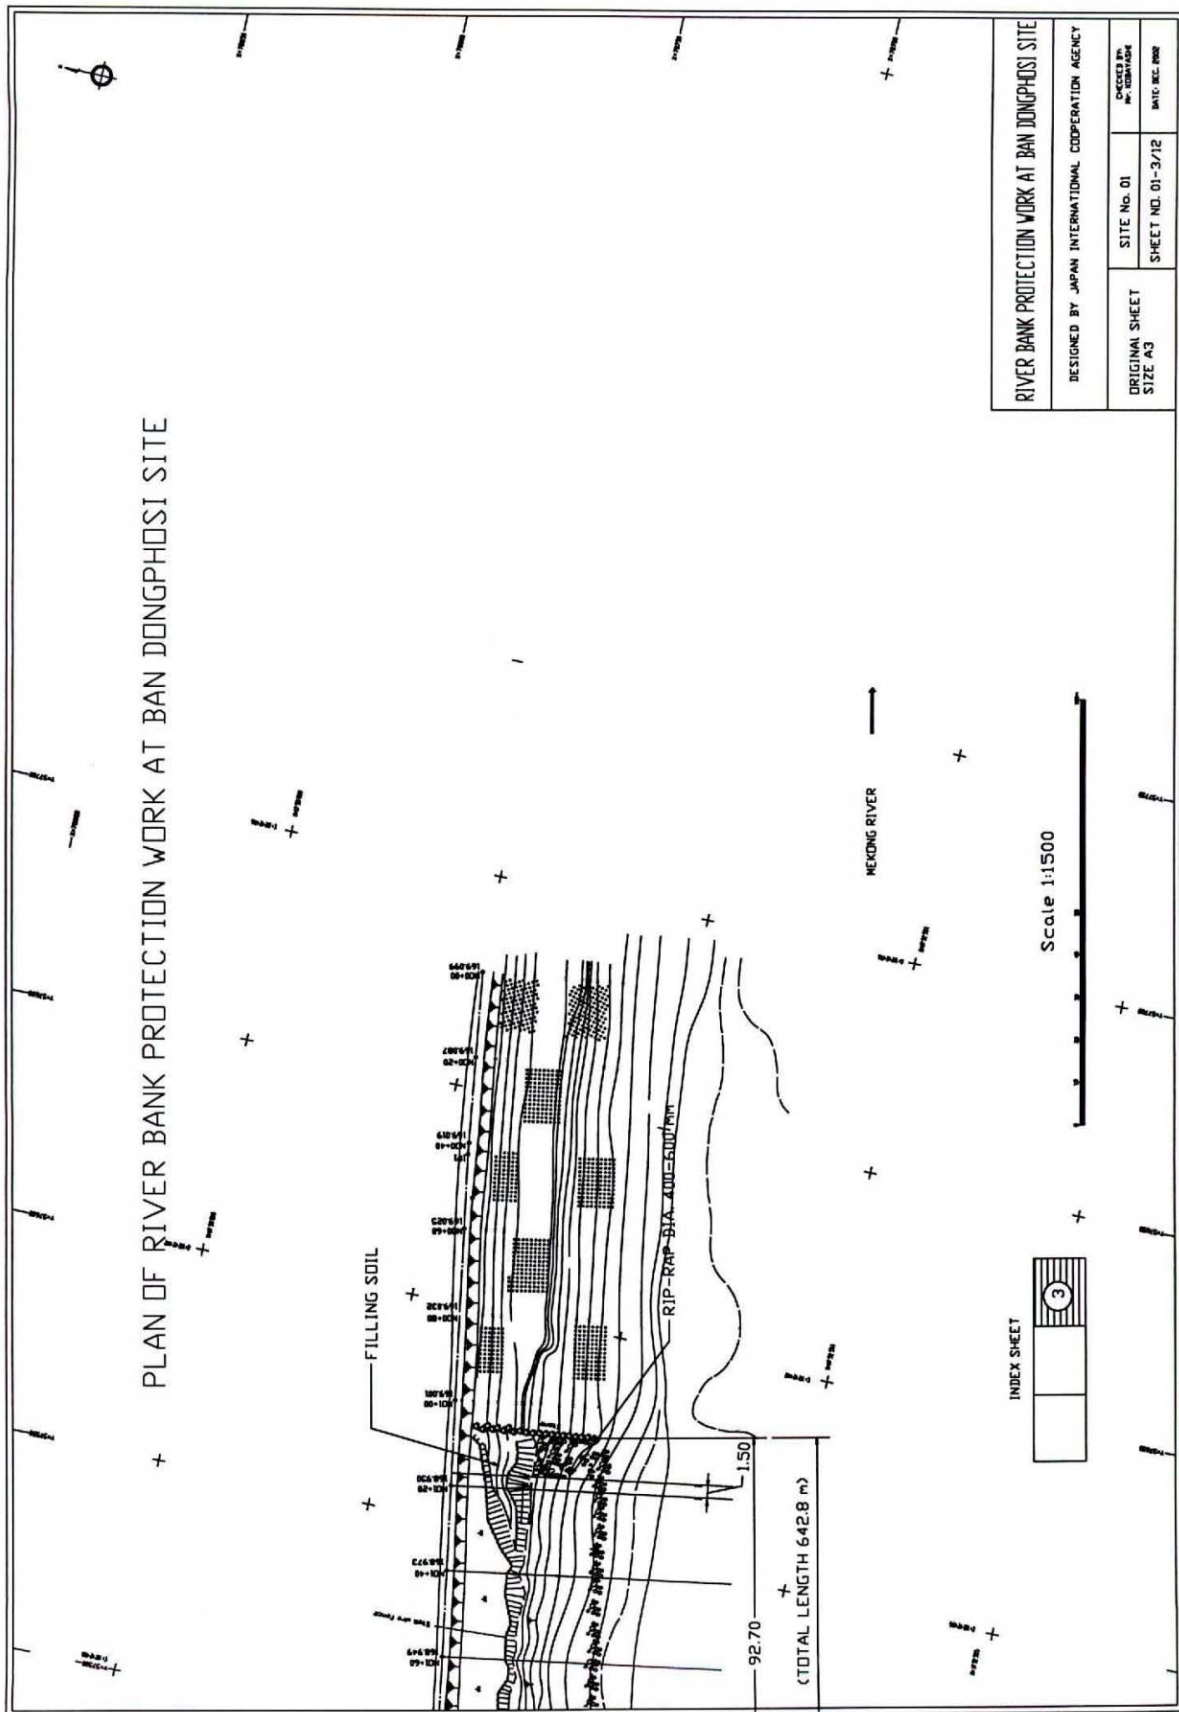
(3/3) Plan of River Bank Protection Work at Ban Dongphosi Site
